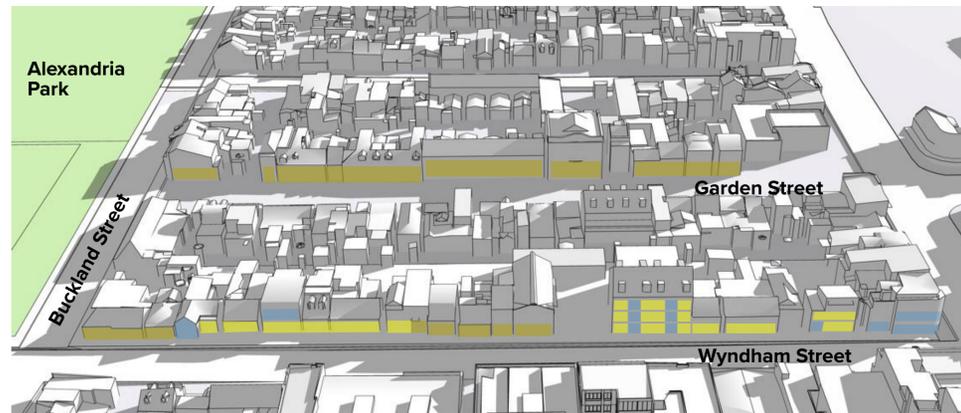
Solar access to adjacent dwellings - 180-184 Cope Street
